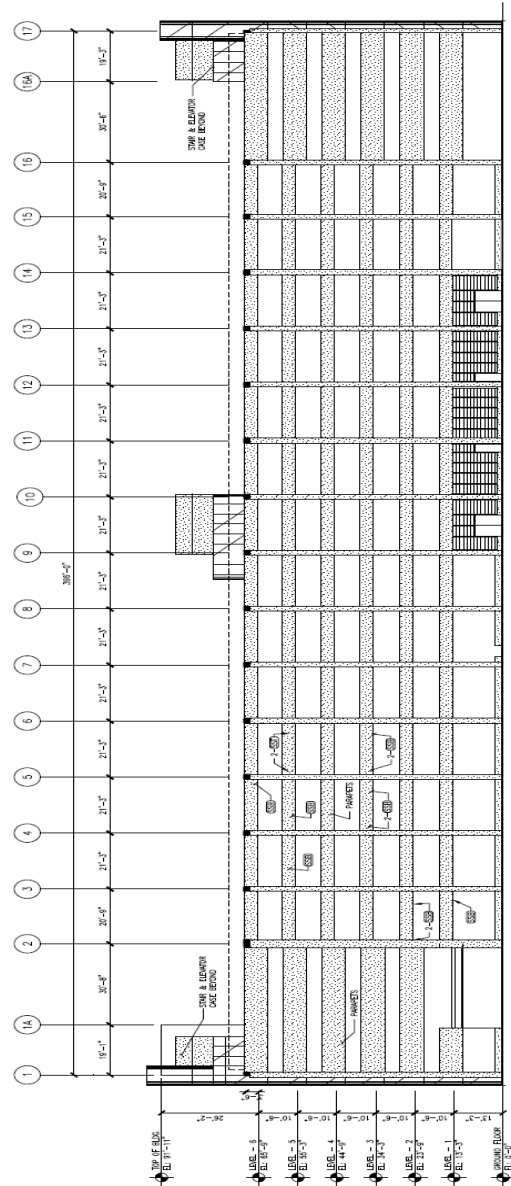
Elevation of Park 2 from west face with dimensions. Exterior rooms within scope visible with louvers. Level 1 begins at 13'-3" elevation with respect to ground floor.
